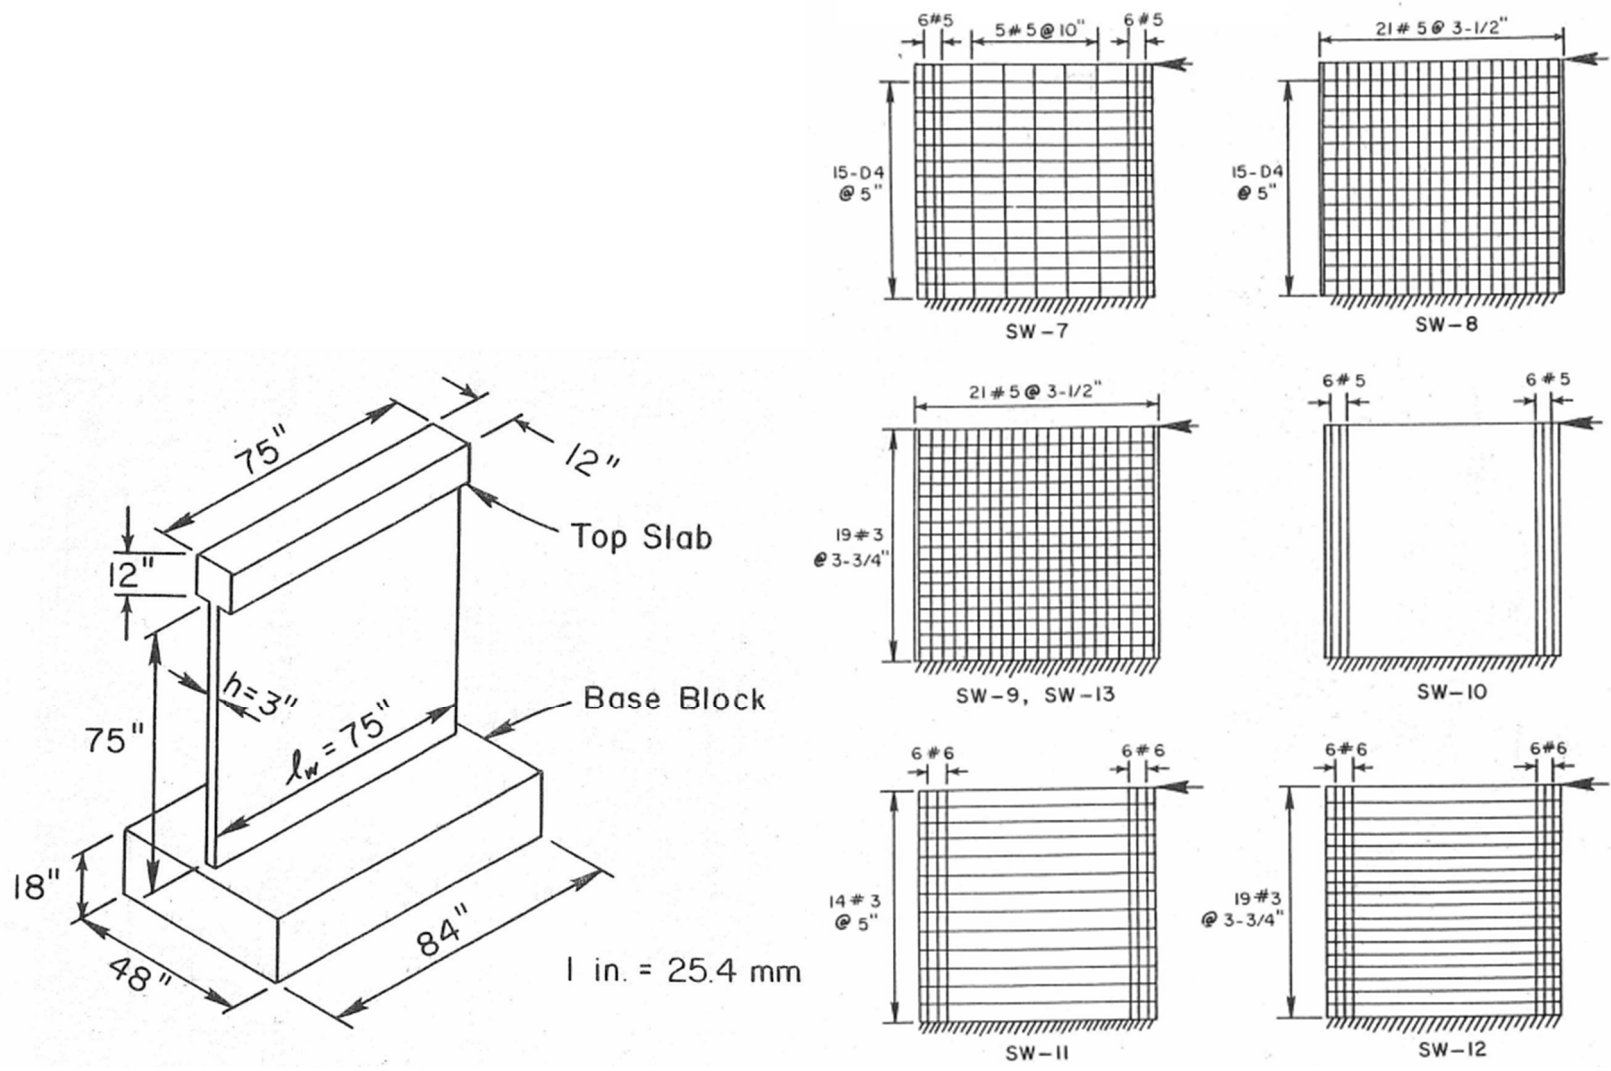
Reinforcement Layout for Low-Rise Shear Wall Specimens (Cardenas et. al. – 1980)
